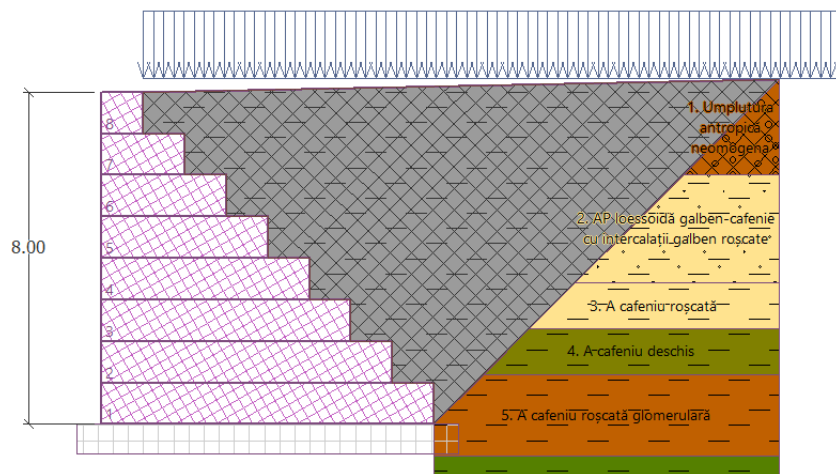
Soil Stratification and Structure Conformation of the Retaining Wall as Gabion Wall
